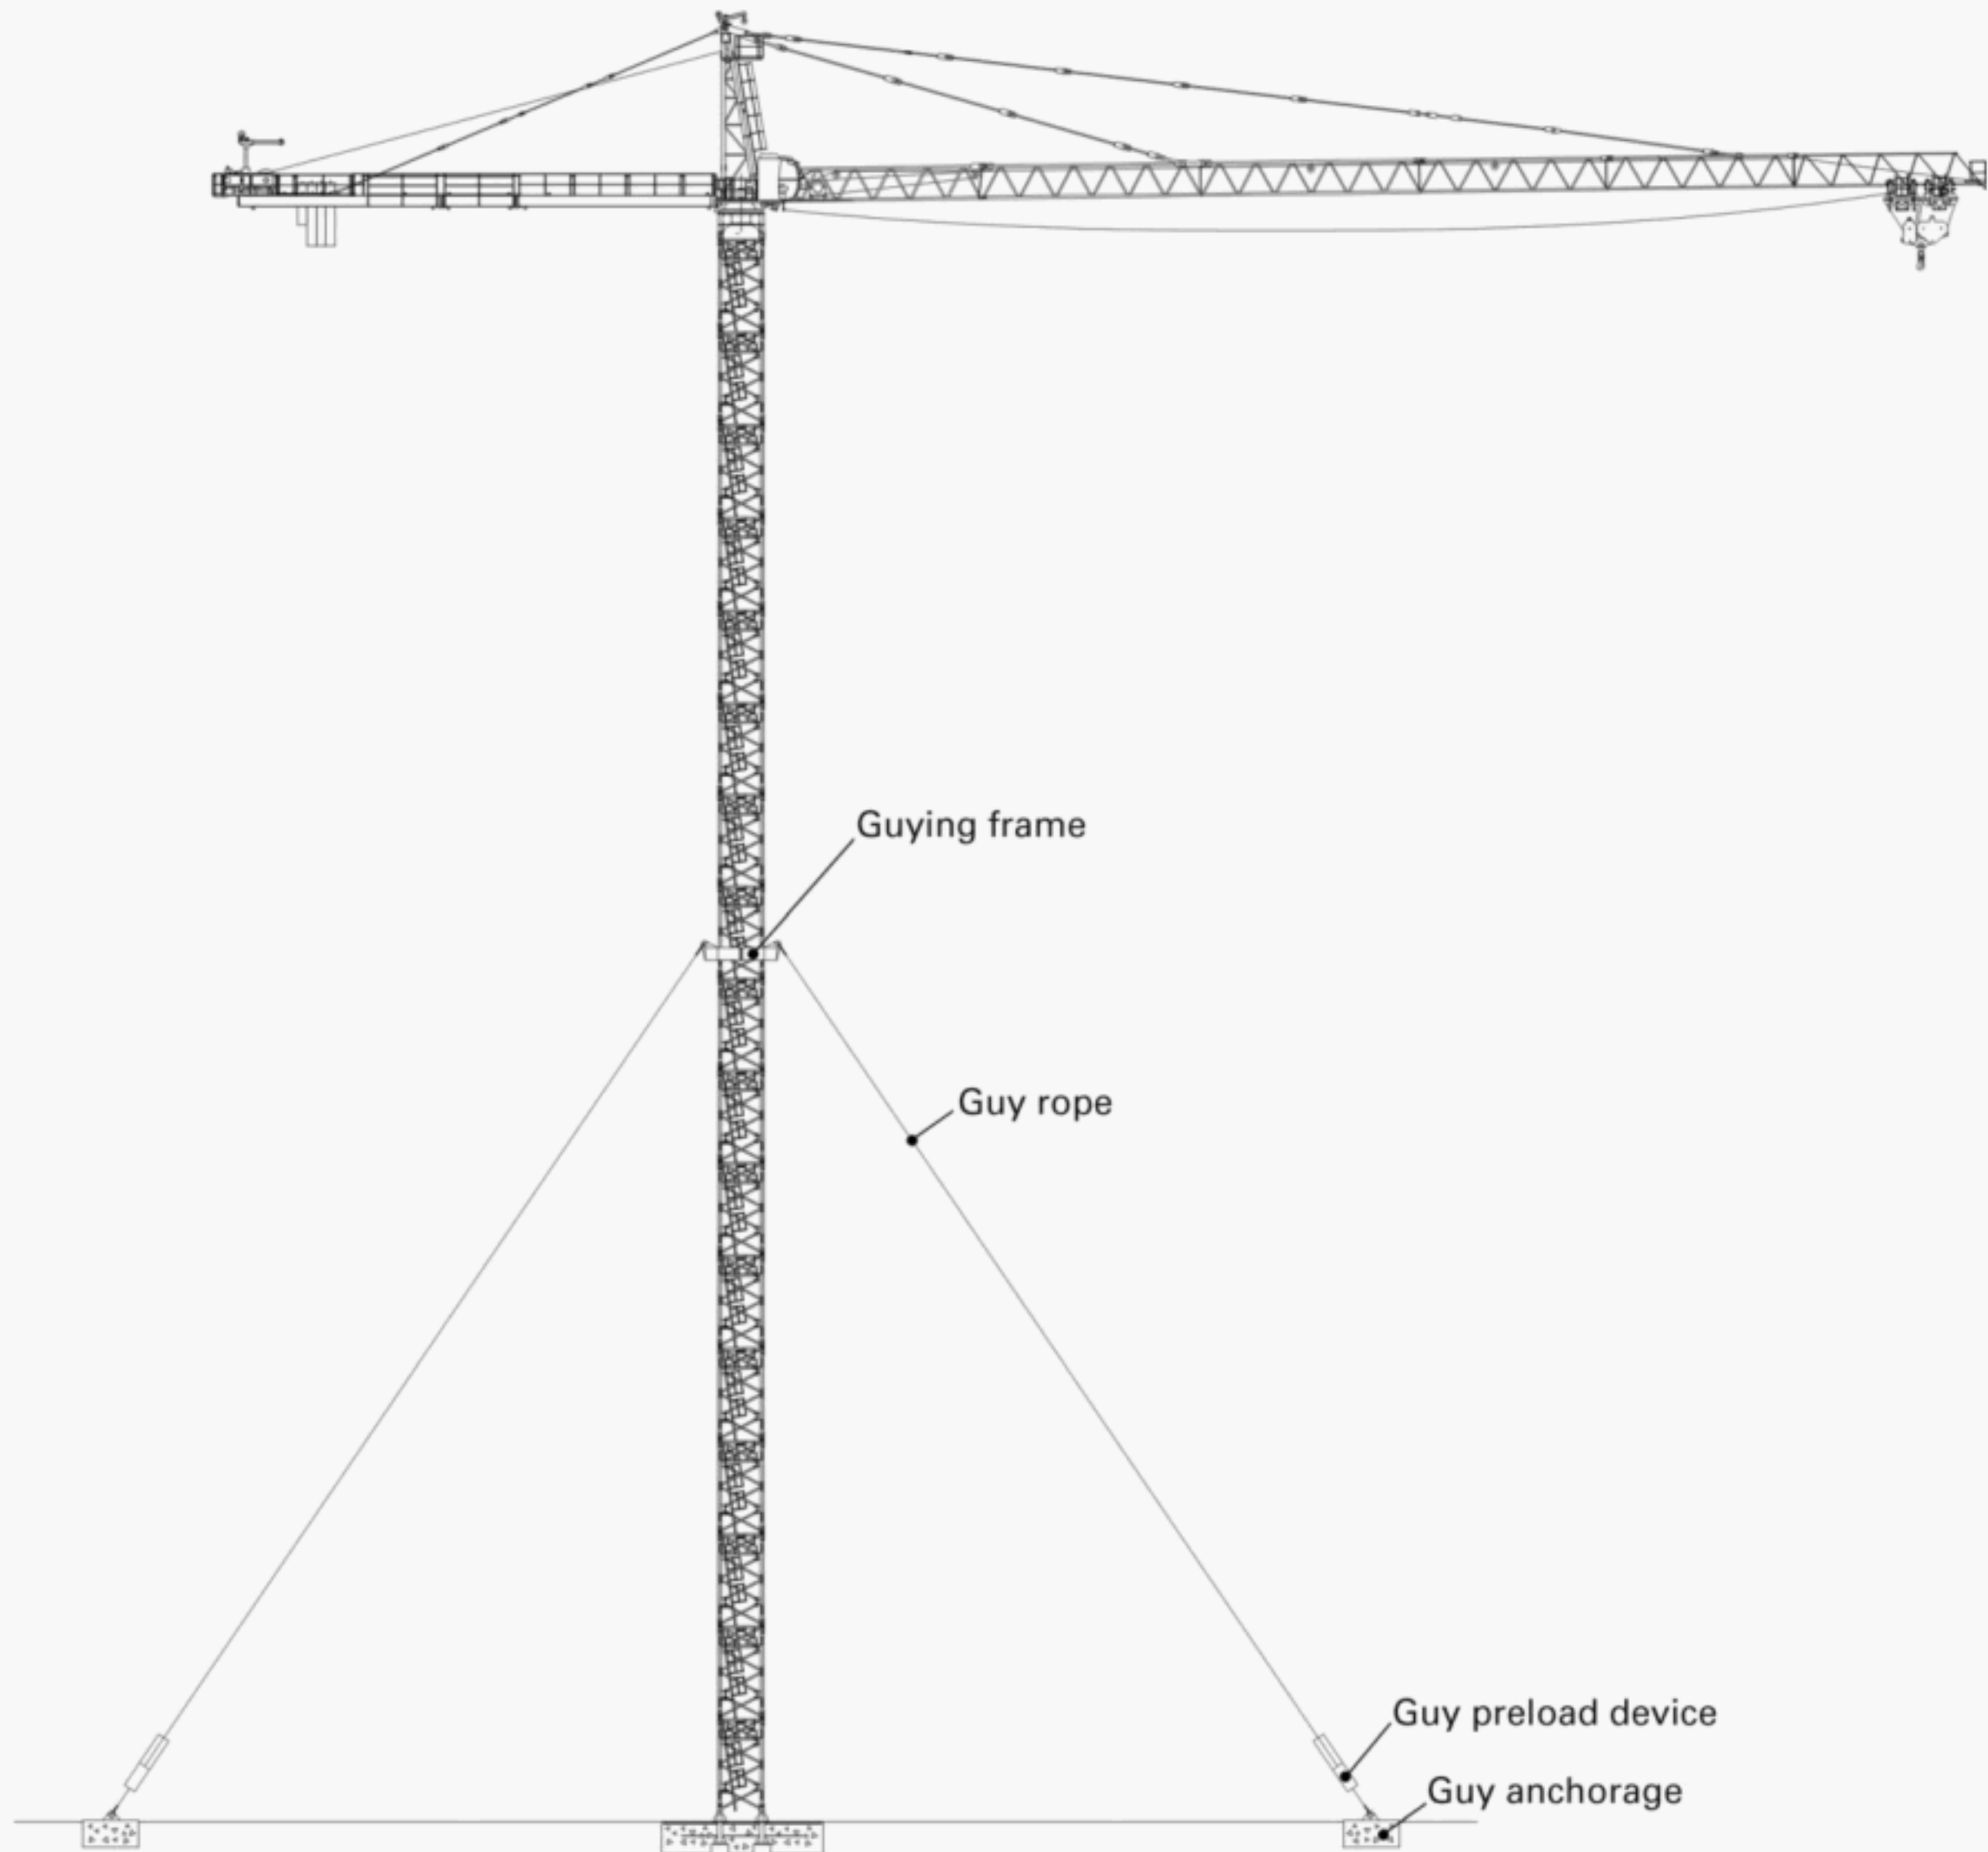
Guyed Tower Crane
